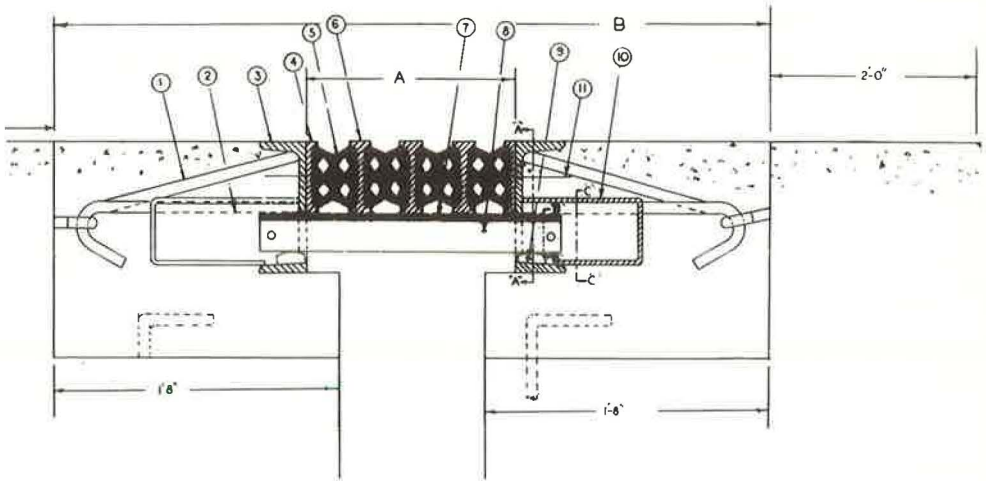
Plan view of 4-tube, 6-in. movement modular system.
